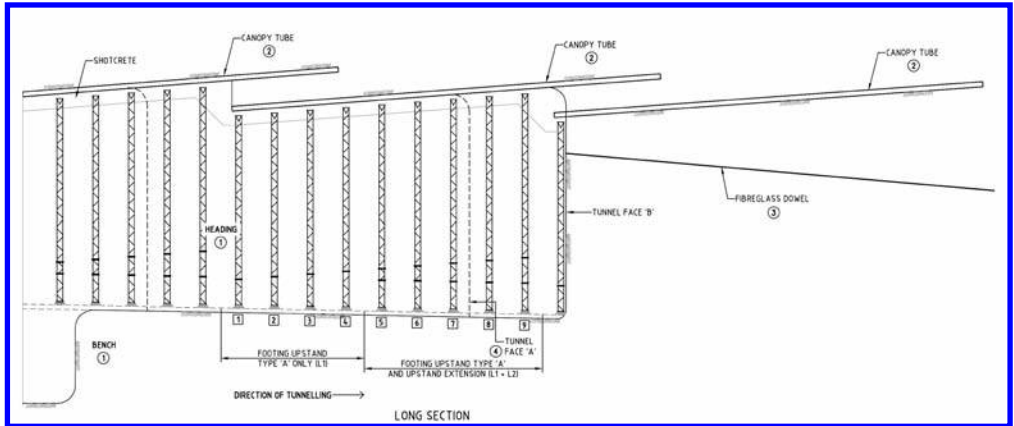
Long section of the tunnel with lattice girders and canopy tubes shown.
